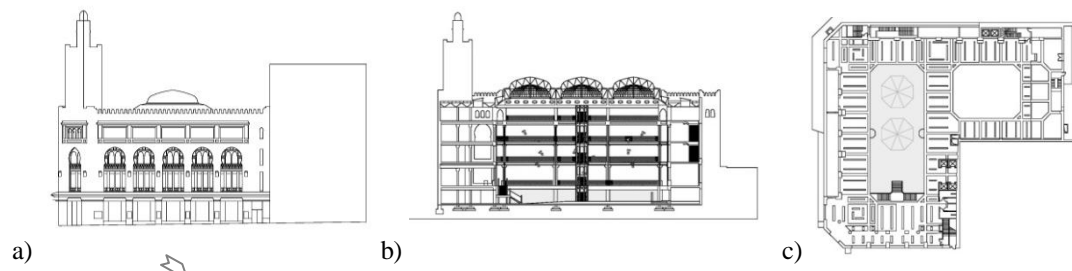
(a) Elevation (b) Section (c) 1st floor plan.
